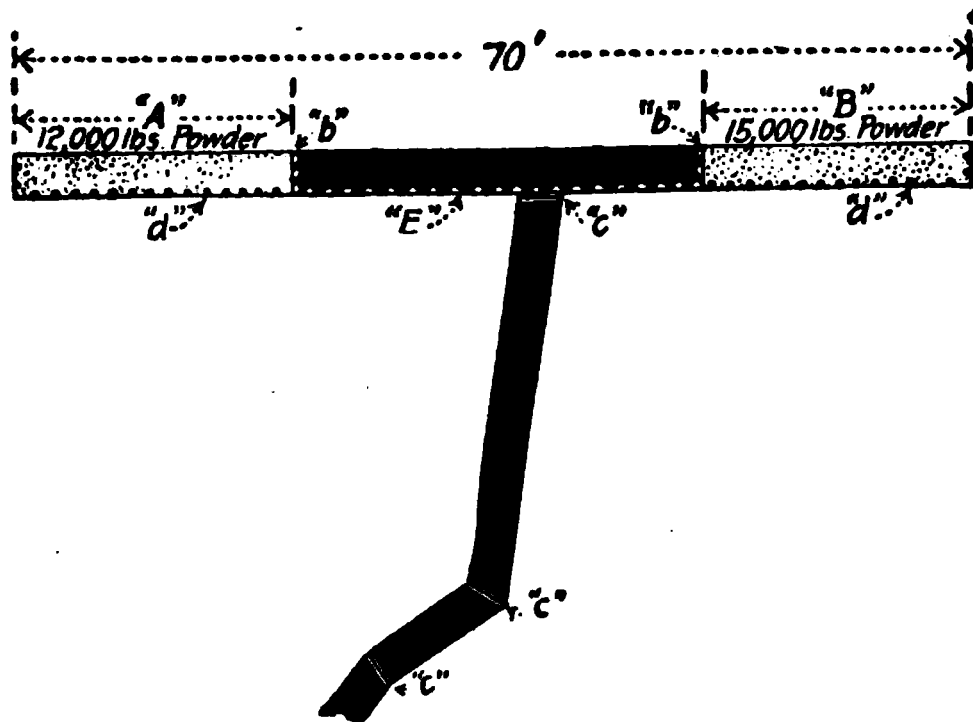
Tunnel Blast at West Beaver Creek, Col.
